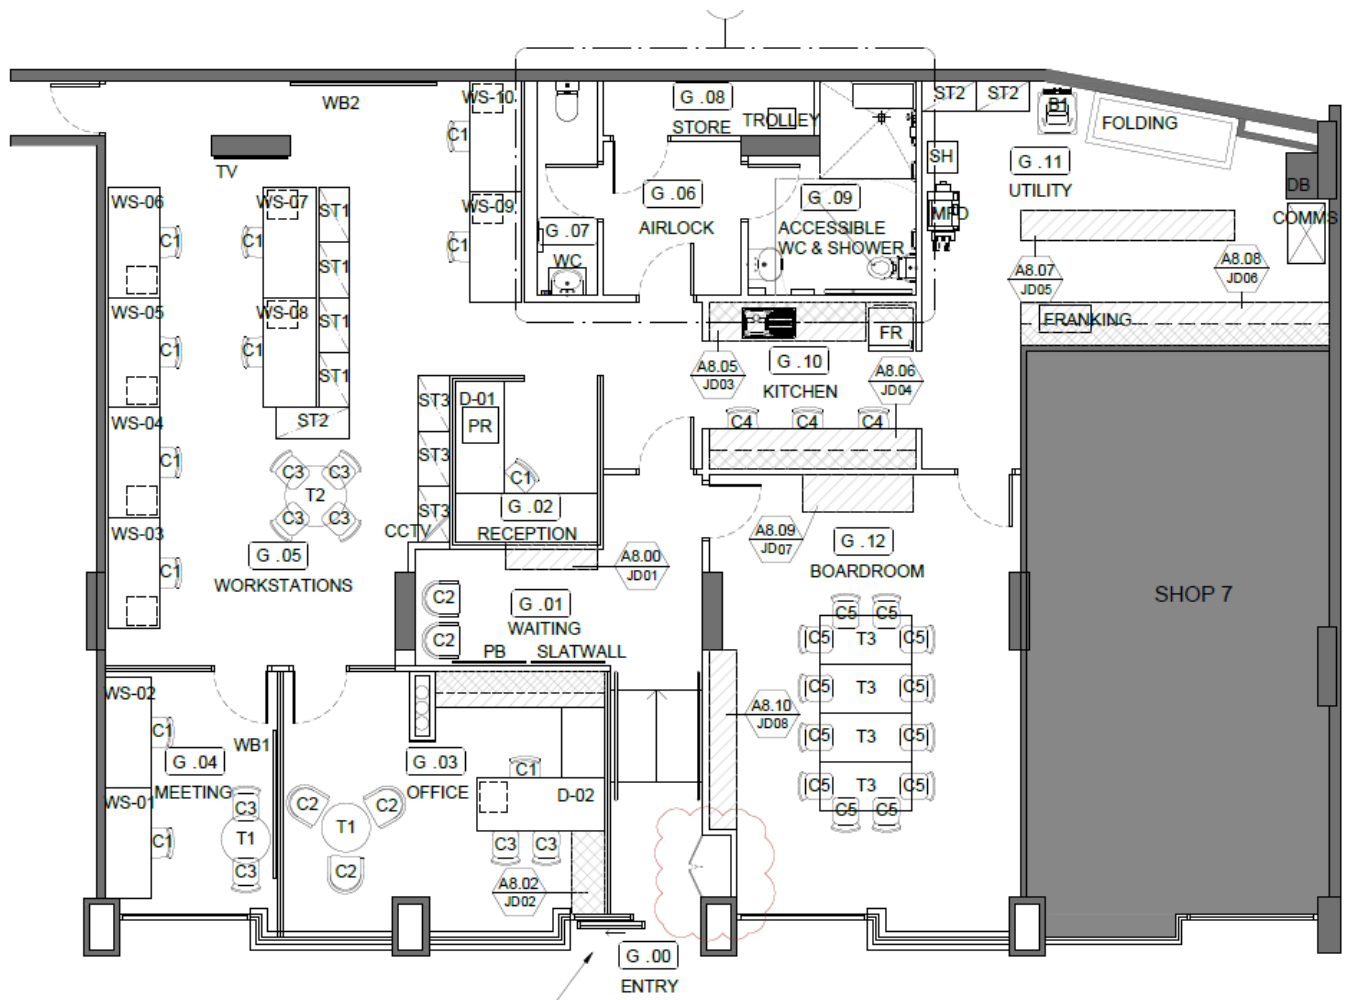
Internal Fitout Plan (Source: AriiSmits 2023)
